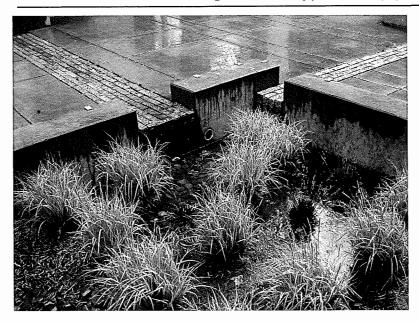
Epler Hall Planter: See Appendix G.1, SW-130, for typical private property planter detail and Appendix G.3, SW-310 through SW-313, for typical Green Street planter details.
